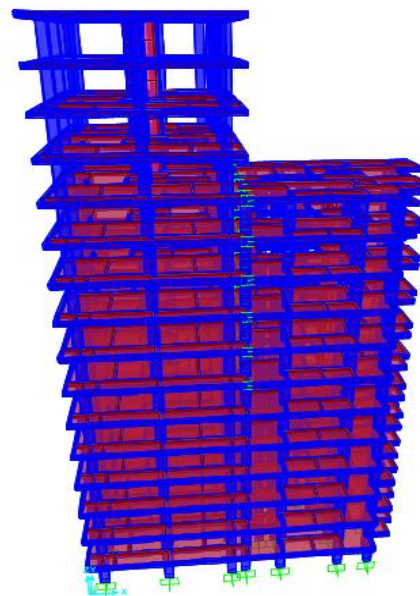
3D View of G+15 building with 3.2m floor to floor height & G+11 buildings with 3.2m floor to floor height with FVD
